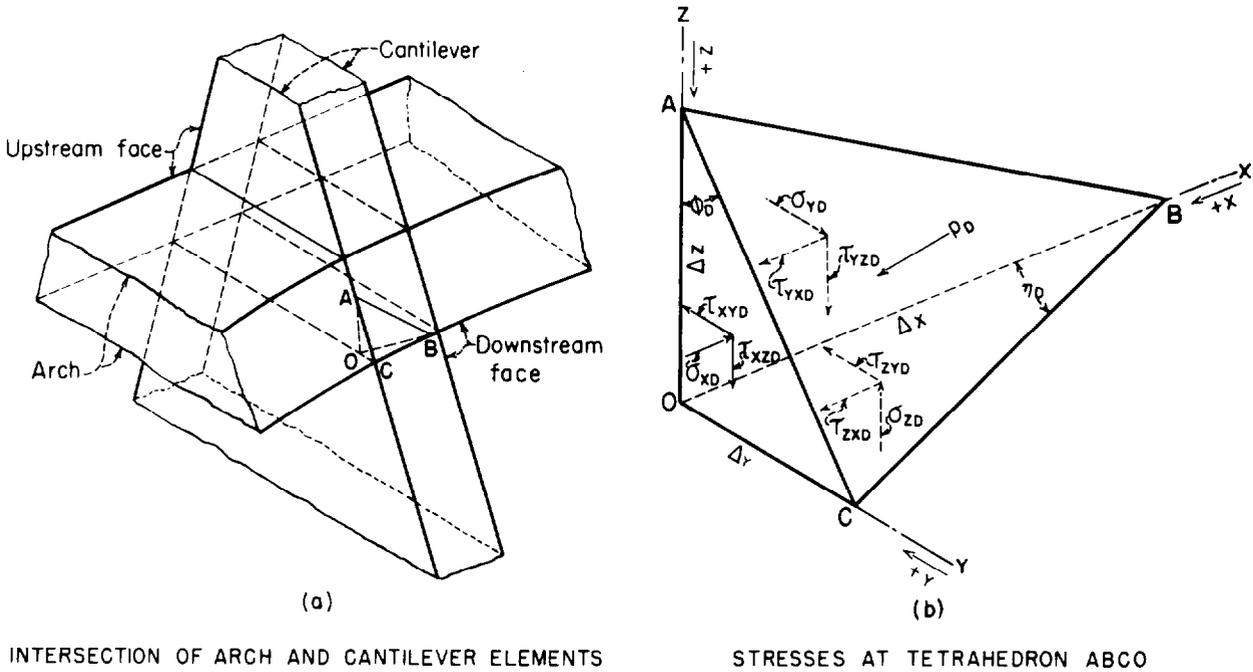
Diagram of stresses in arches and cantilevers.—288-D-438
